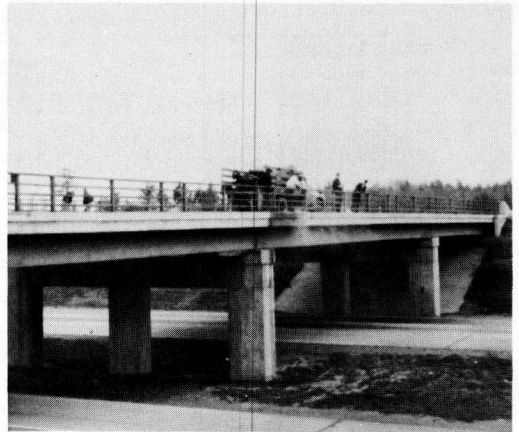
Treating fascia and pier facings of Schenectady Interchange bridge, November 16, 1956.
